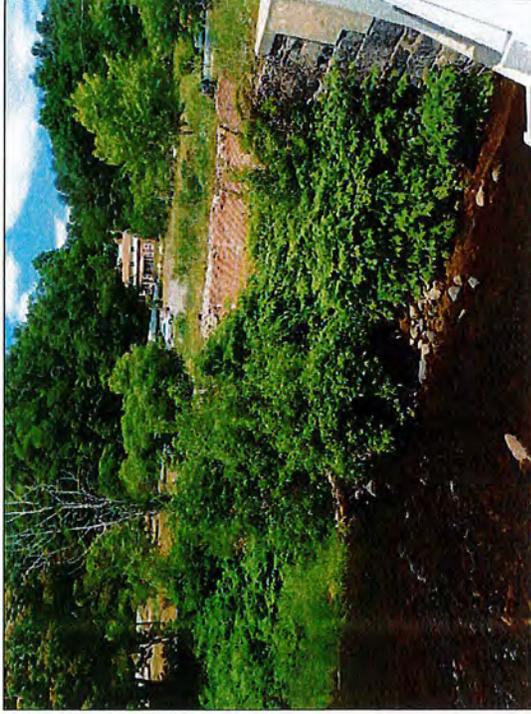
Sheldon Street: Deteriorated brick outfall (flowing), vegetation, upstream left bank.
